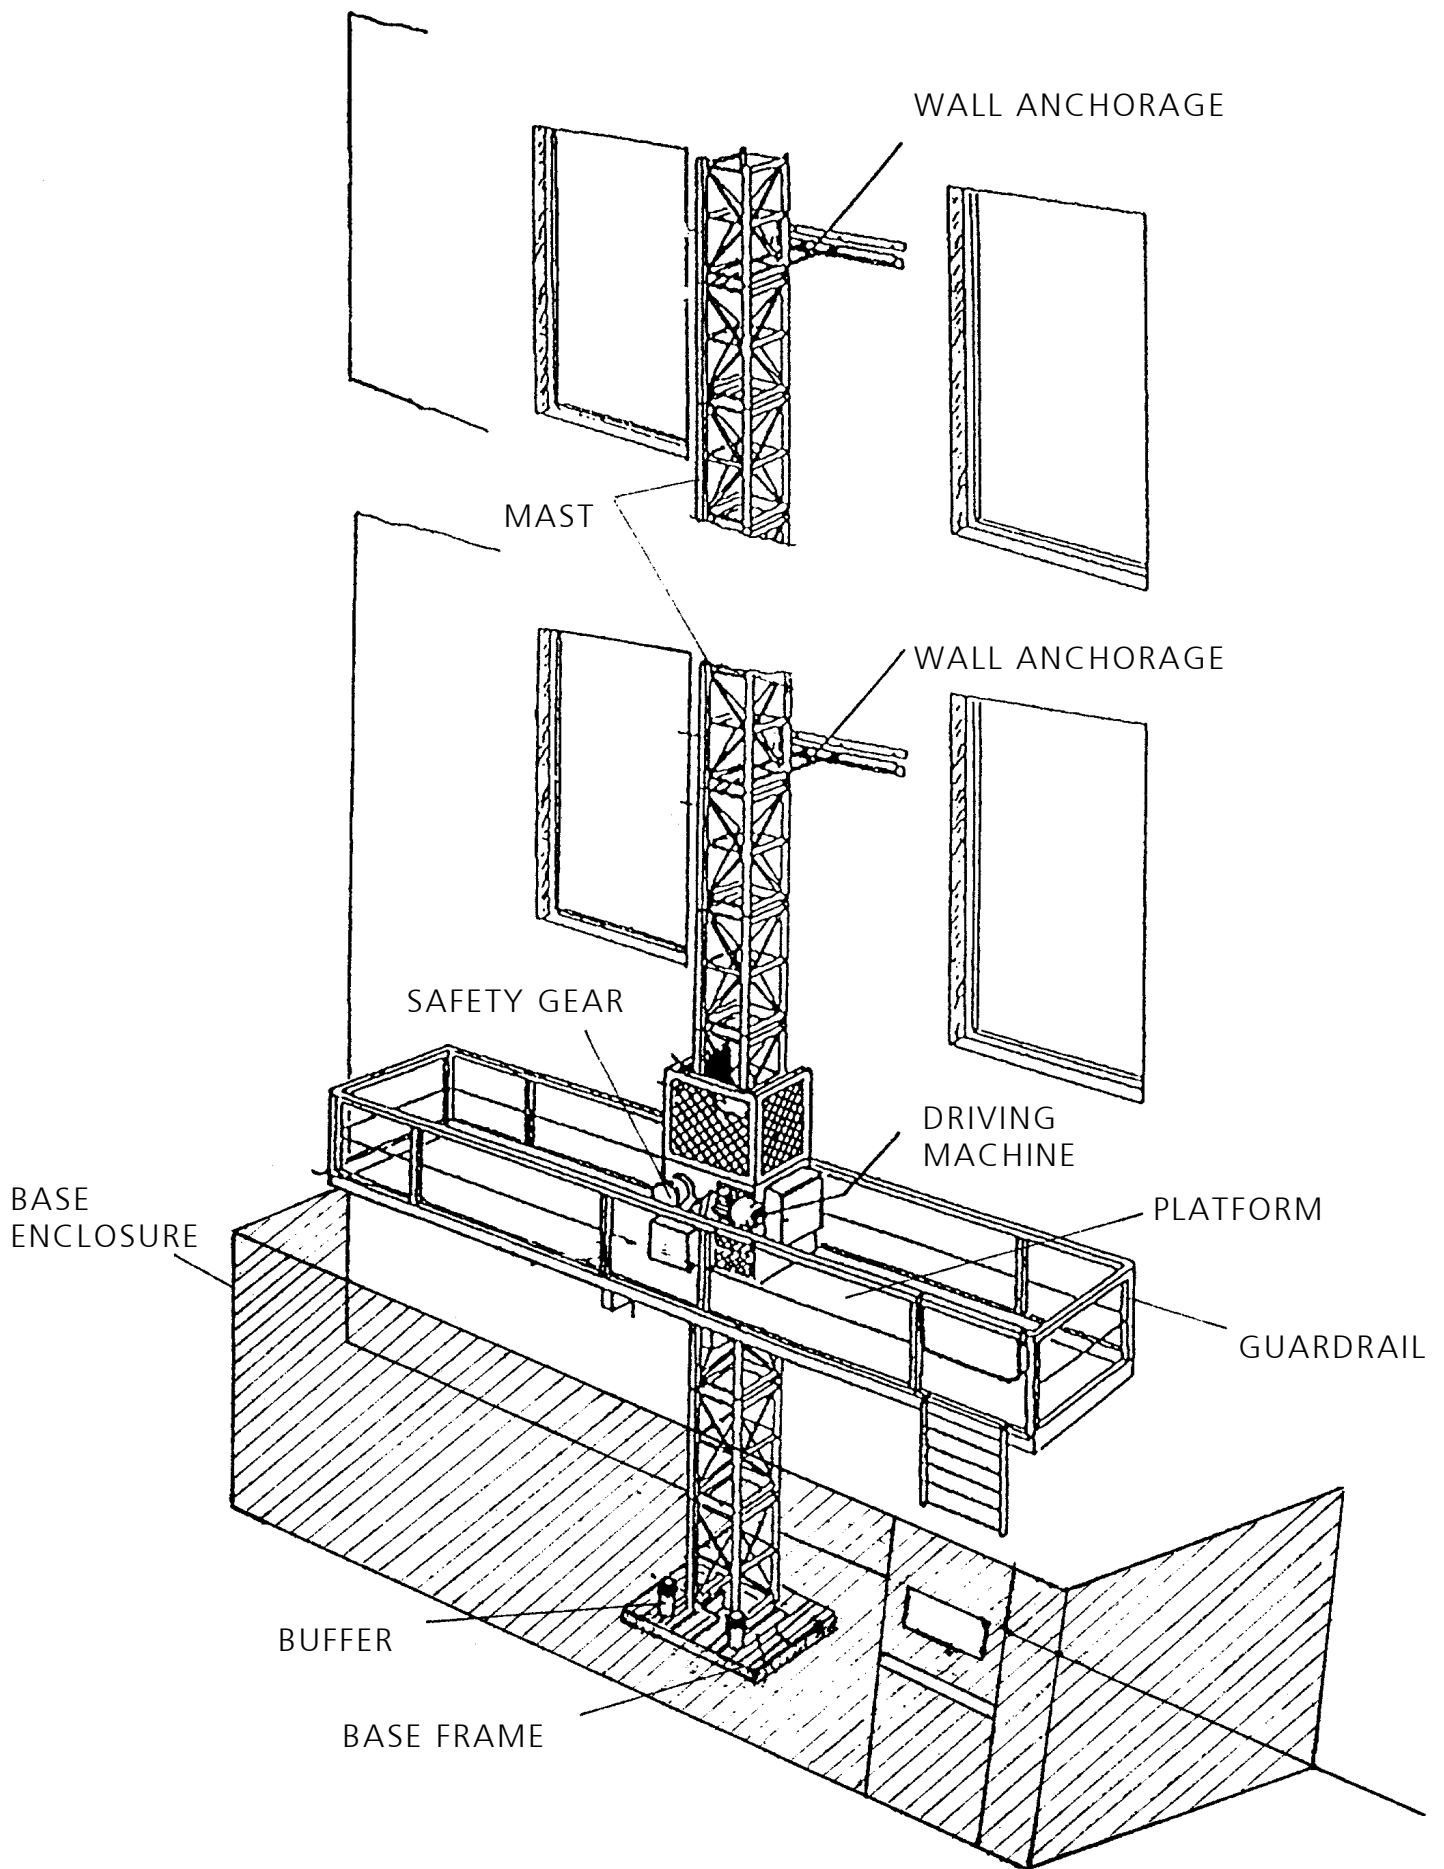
ONE TYPICAL LAYOUT OF A TOWER WORKING PLATFORM OF FIXED TYPE
